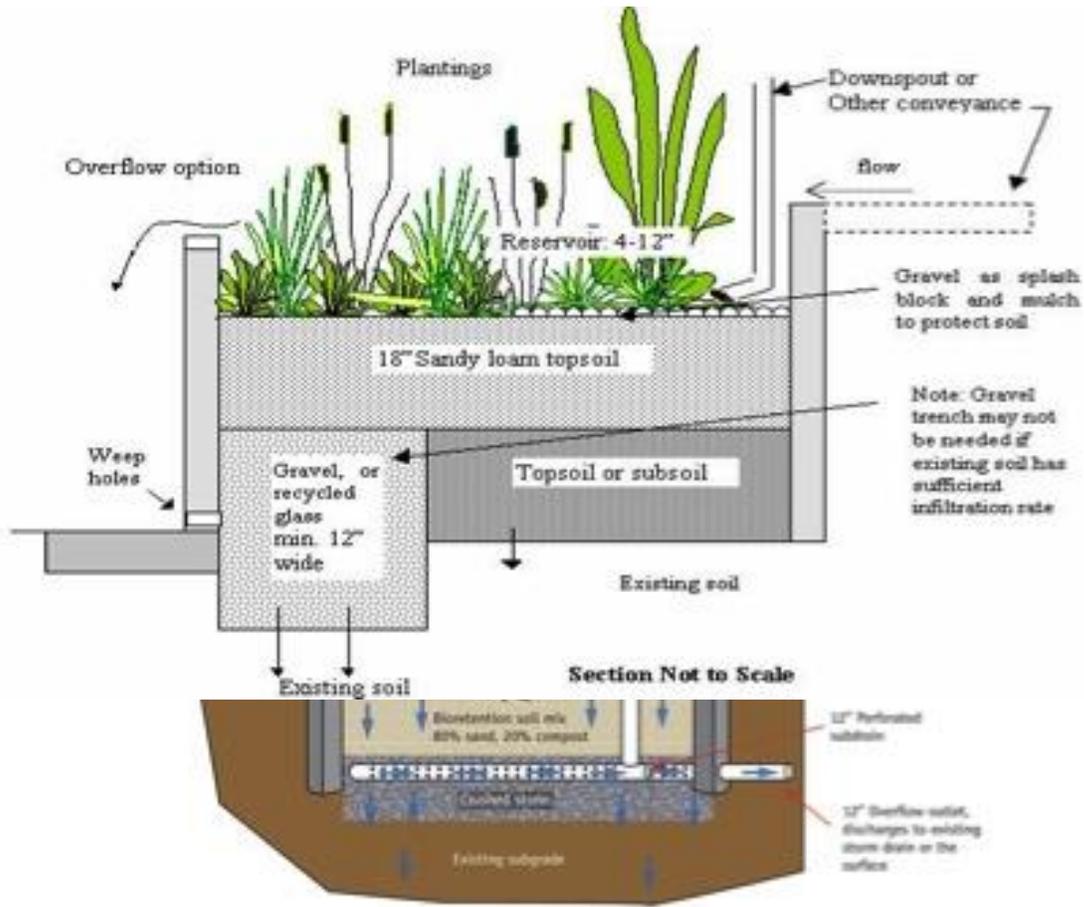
Example Stormwater Infiltration Planter Box Biofiltration System
